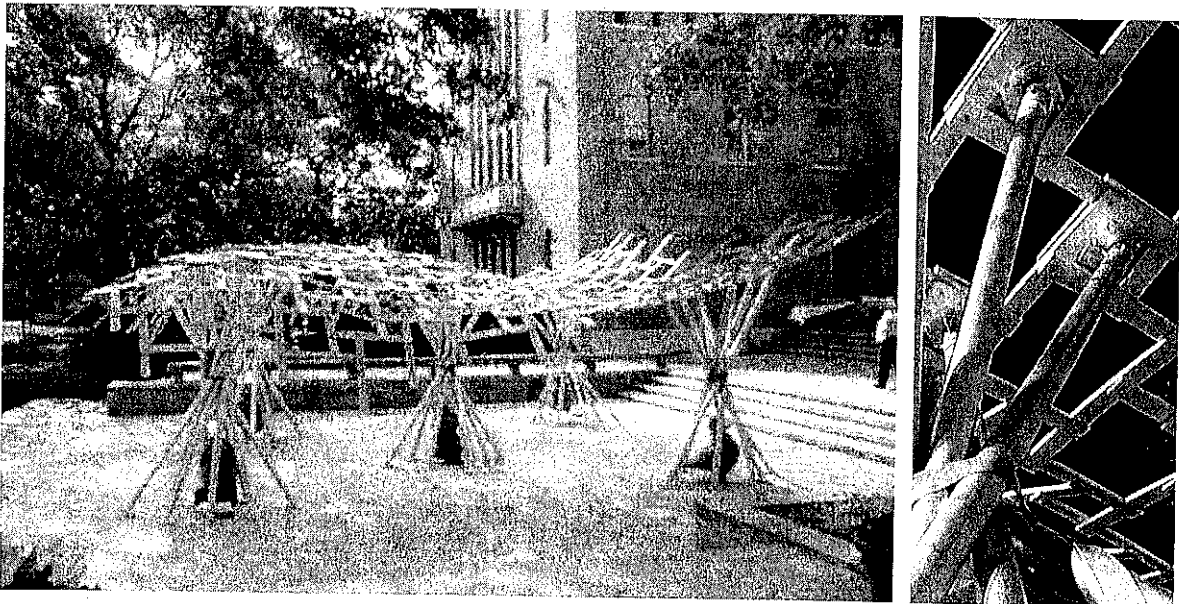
22 Bamboo Roof at Rice University in Houston, USA, 2002/03, Shigeru Ban Architects (ref. Shigeru Ban Architects)
